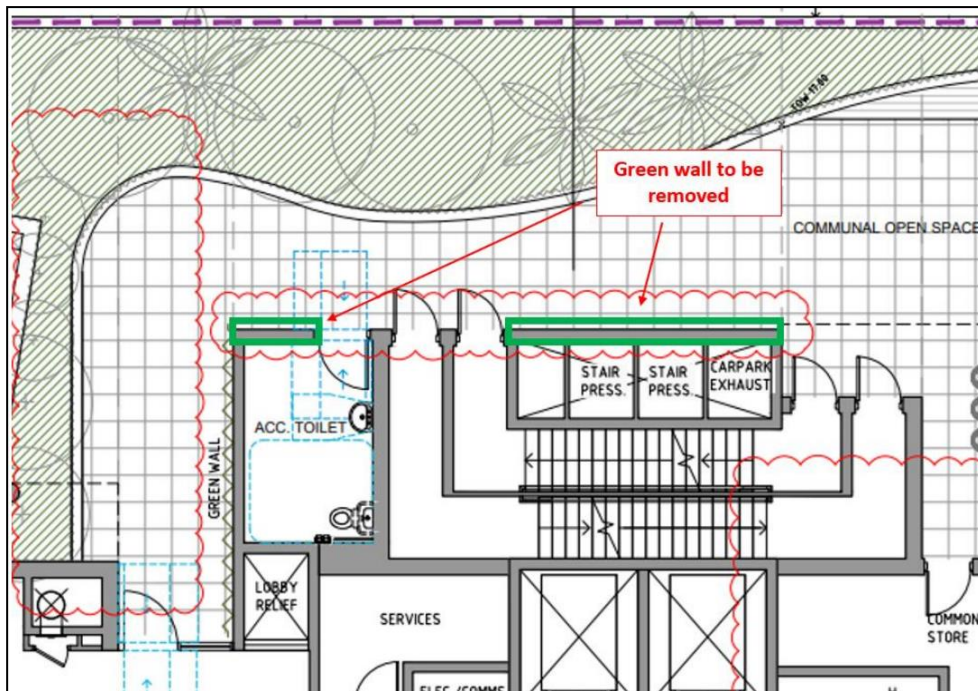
ground floor green wall – western elevation (source: Applicant's MA22/0137 cover letter)
